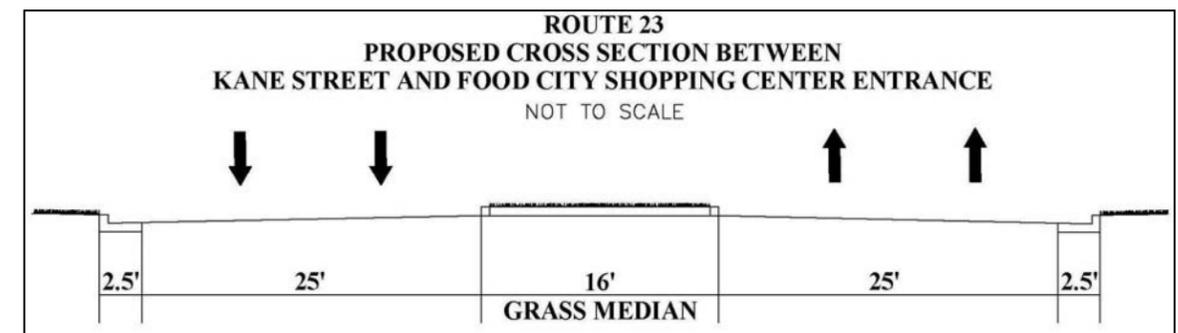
Proposed Cross Section Between Kane Street and Food City Shopping Center Entrance
